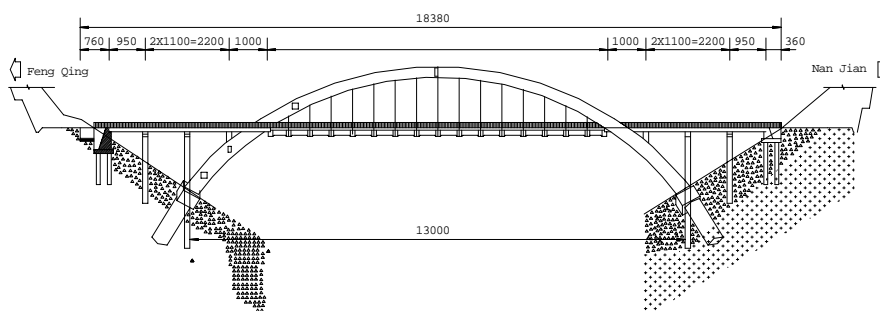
Elevation drawing of Xiaowan Arch Bridge (unit: cm).
